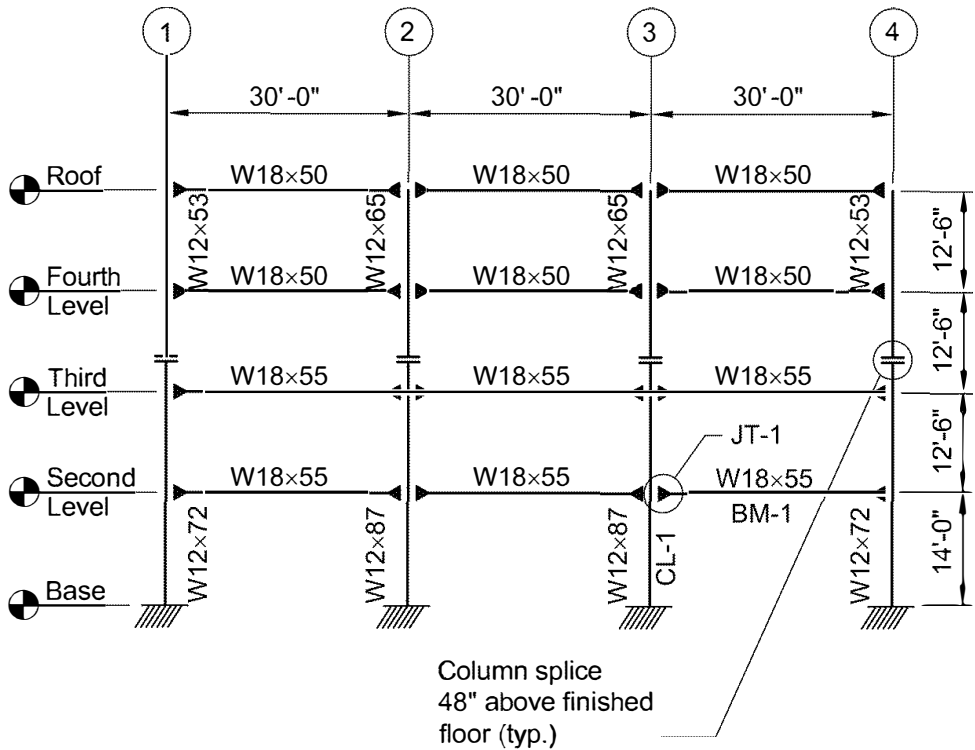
Moment frame elevation for Examples 3.4.1, 3.4.2, 3.4.3 and 3.4.4.
